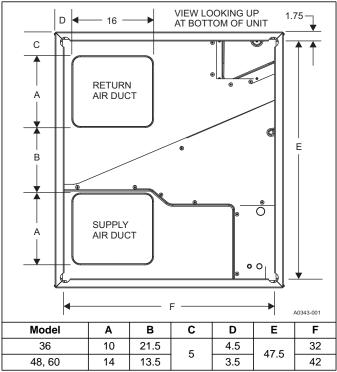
Duct Dimensions (inches) - Bottom View Looking Up
